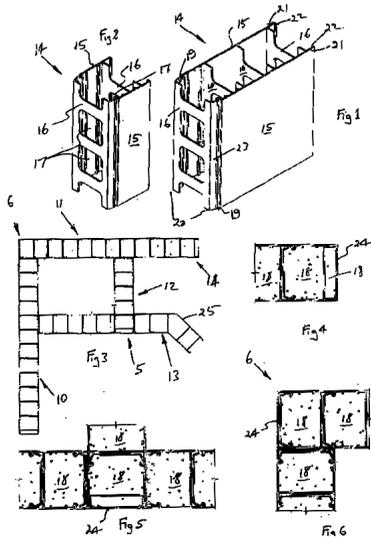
The Dintel ® Construction System: concrete cast in PVC elements.
